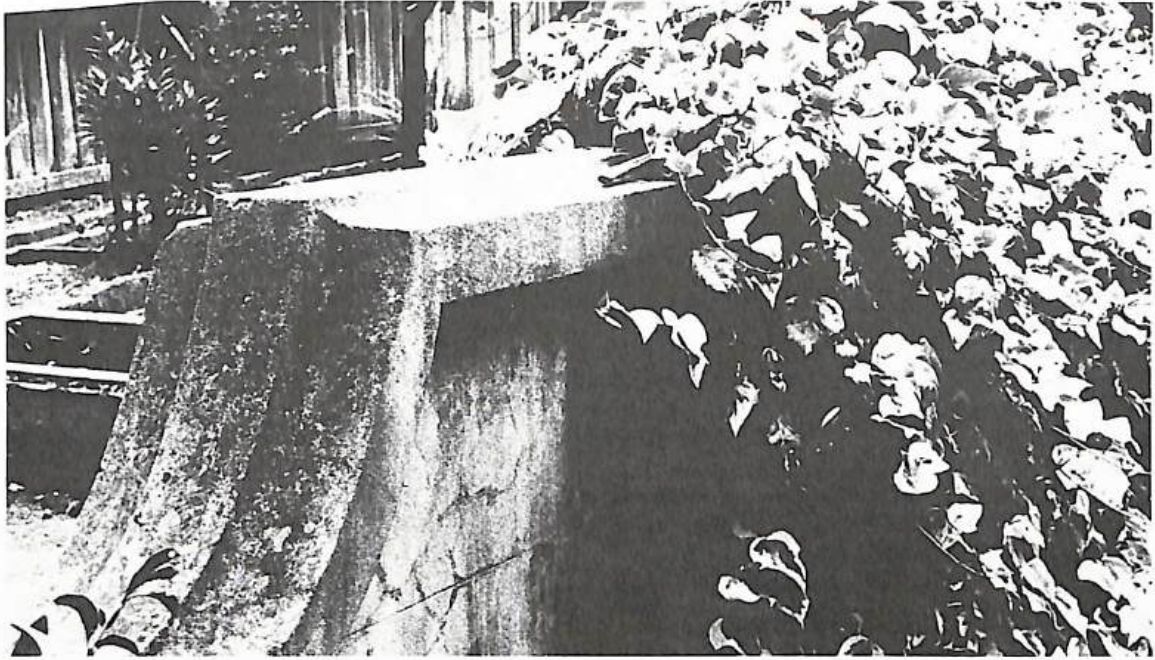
Paving at the North-East Corner of the House and Detail of Render Wall Capping. (PSD)
